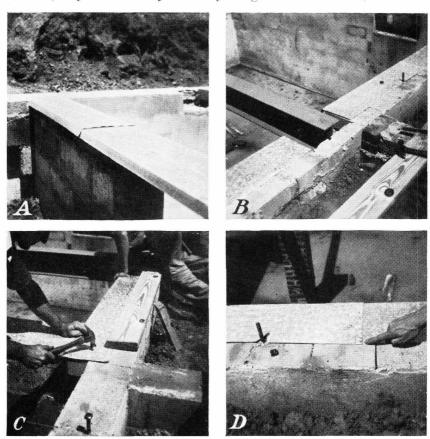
Improper methods of shielding. A, Bread-pan or through shield with penetrable lapped, unsoldered joint; B, uncapped strip shield on top of wall, also unprotected steel I-beam; C and D, shield nailed to concrete, metal joints penetrable, sill unprotected from hidden attack through unfilled joints in masonry.
